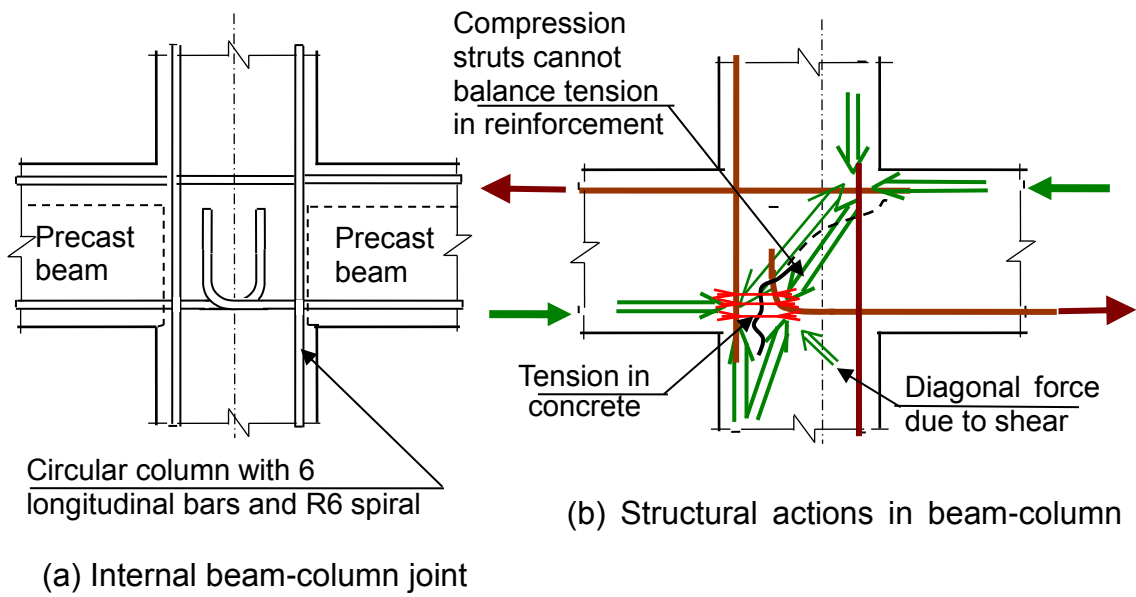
Internal Beam-column joint (see 1 in Figure 24)
